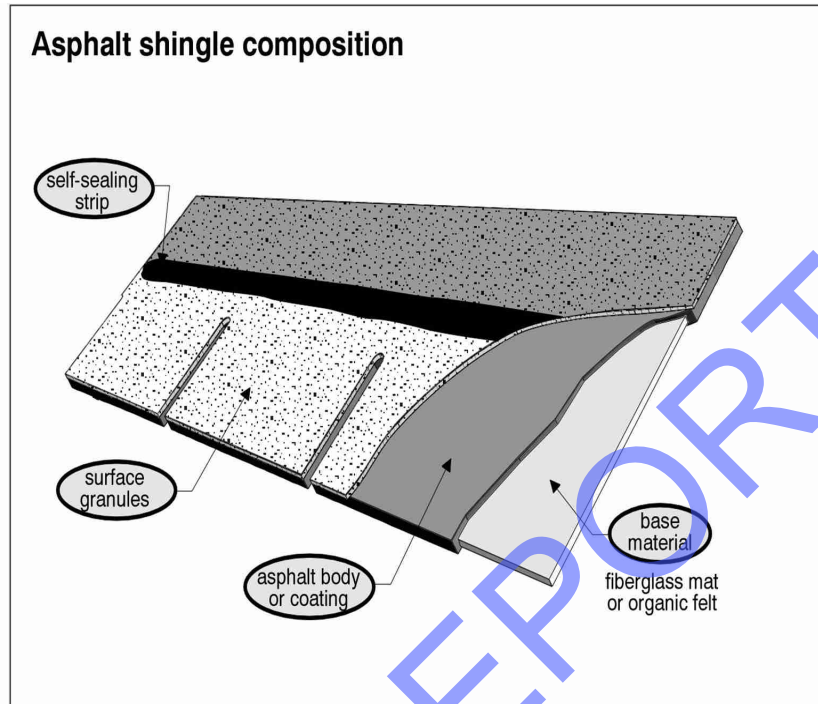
Asphalt Shingle Roof Installed - Illustration
